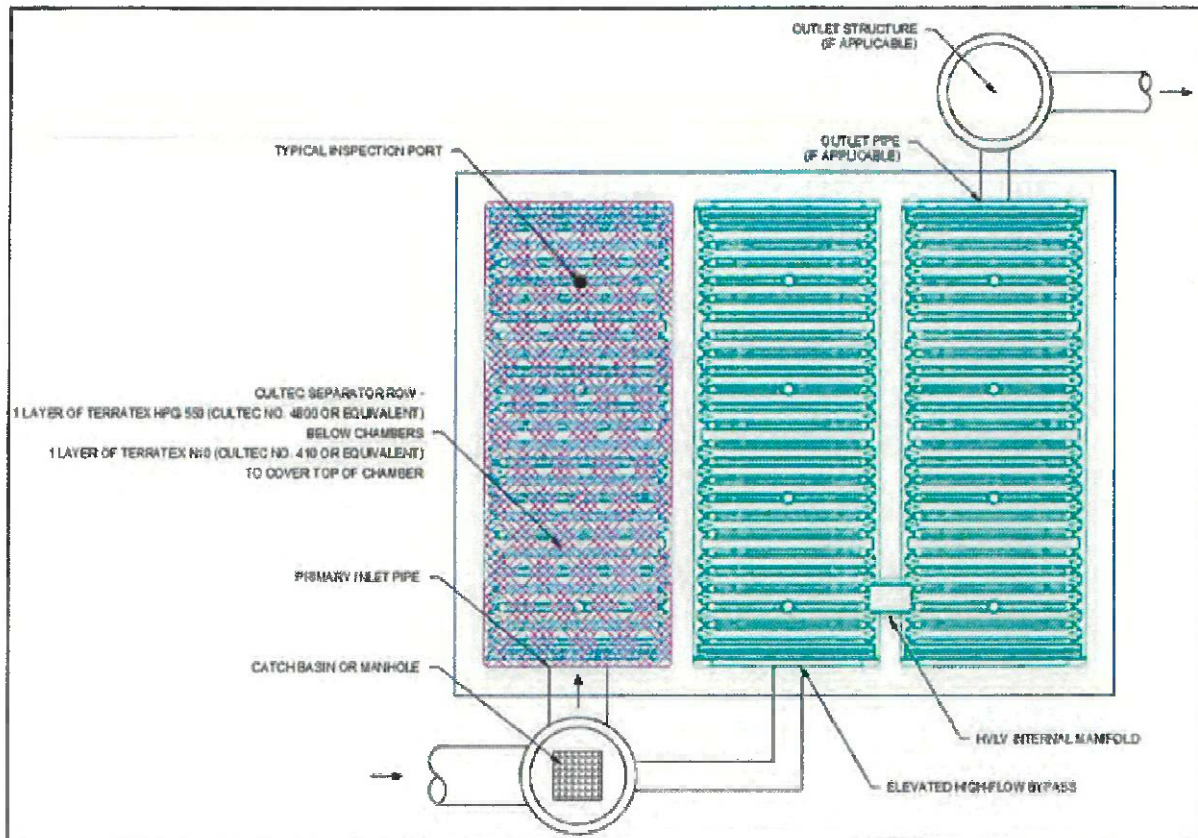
Cultec Separator Row™ Filtration System – Plan View
